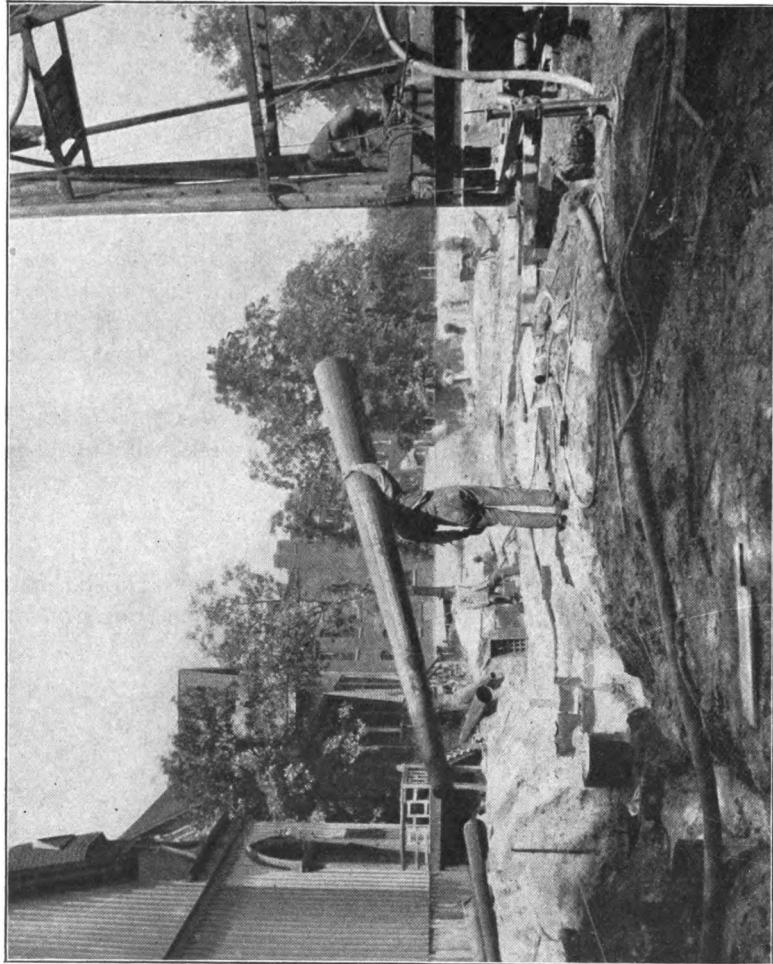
Shell for Raymond Concrete Pile, 20 Feet Long, Weighing 70 Pounds.
